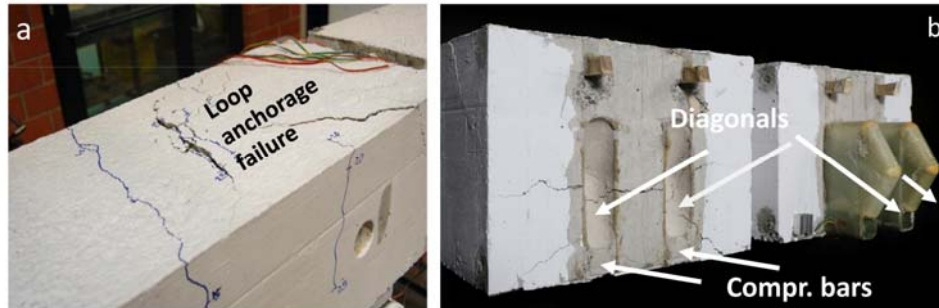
Failure mode of beam G600: a) top concrete failure in loop anchorage zone, b) cracks through the hexagon diagonals' support area of interior (left) beam, undamaged hexagons in cantilever (right) beam.
